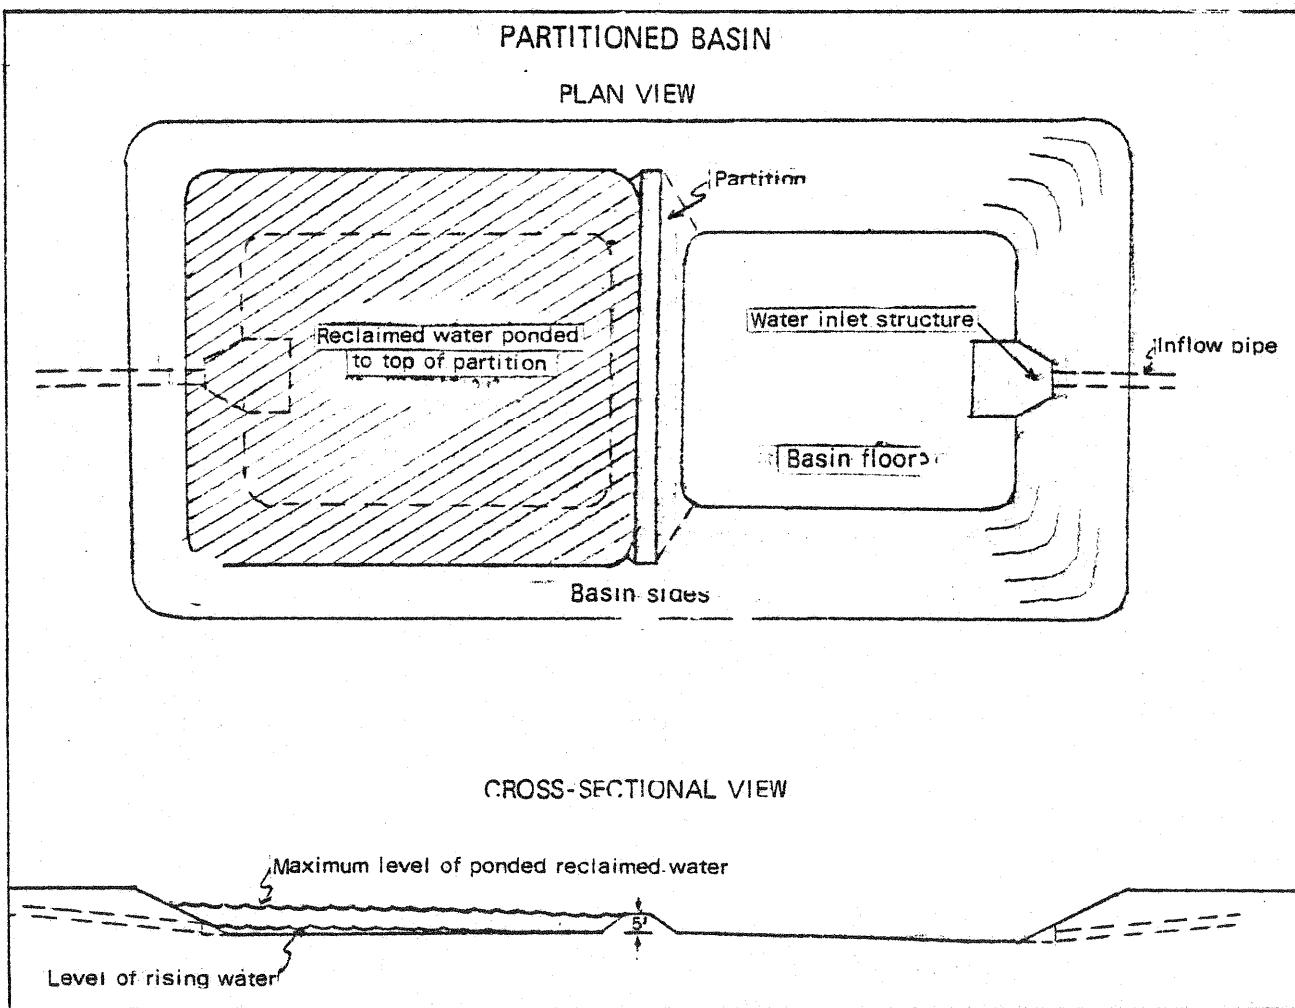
Plan view and cross section of a storm-water basin showing rising and maximum levels of ponded reclaimed water.
